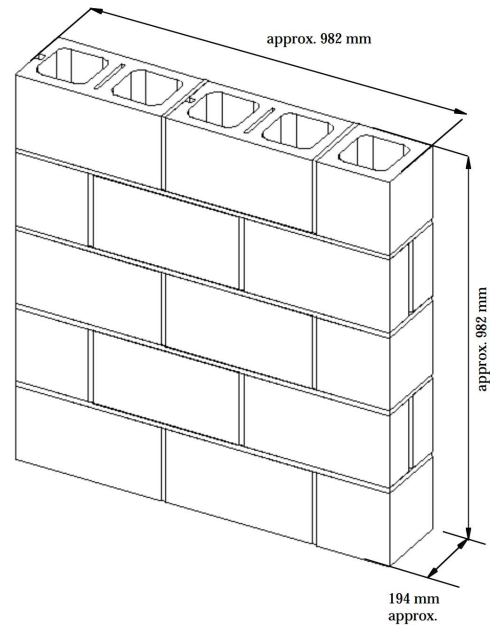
Diagram of concrete masonry block wall, sample CB1 [13].
